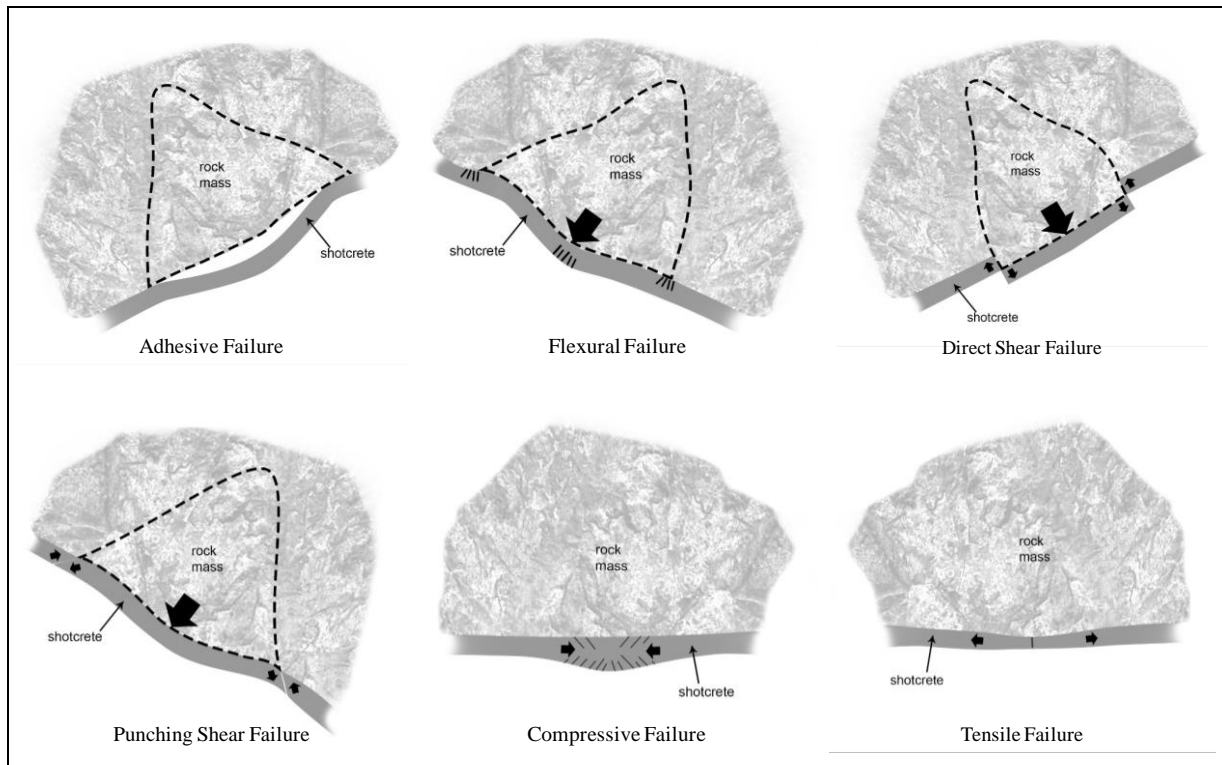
Potential Failure Modes of Shotcrete
